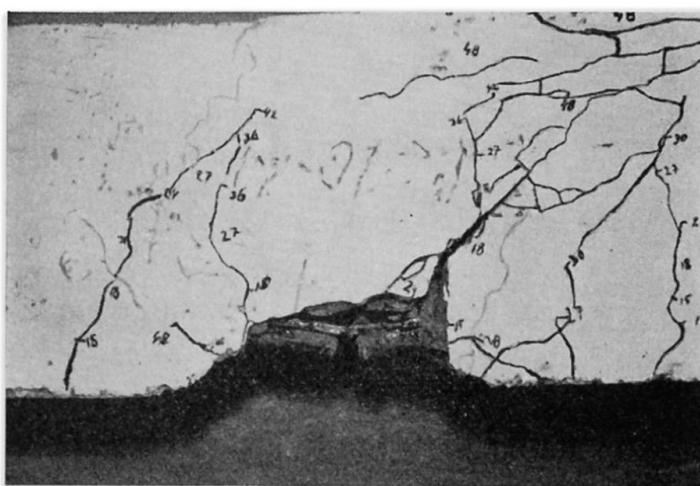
Same joint as 4, with the plate lying over the bars. The photo taken after the failure of the beam. The concrete is thrown out due to the bending of the jointing steel.
